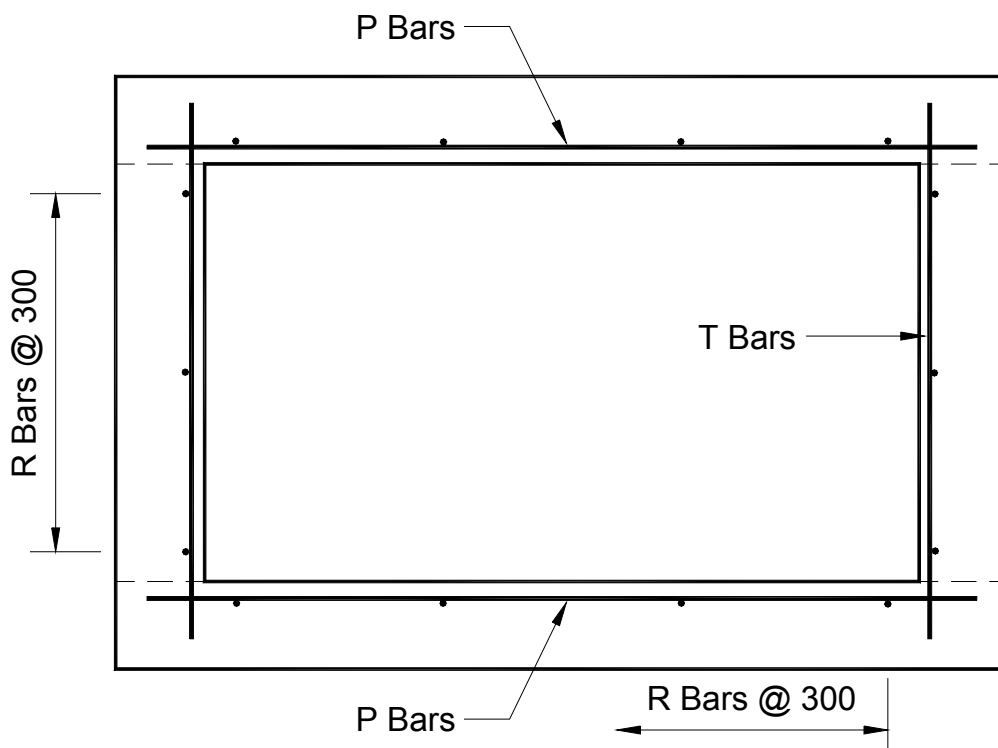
(b) NON-RIGID FRAME BOX CULVERT REINFORCEMENT
